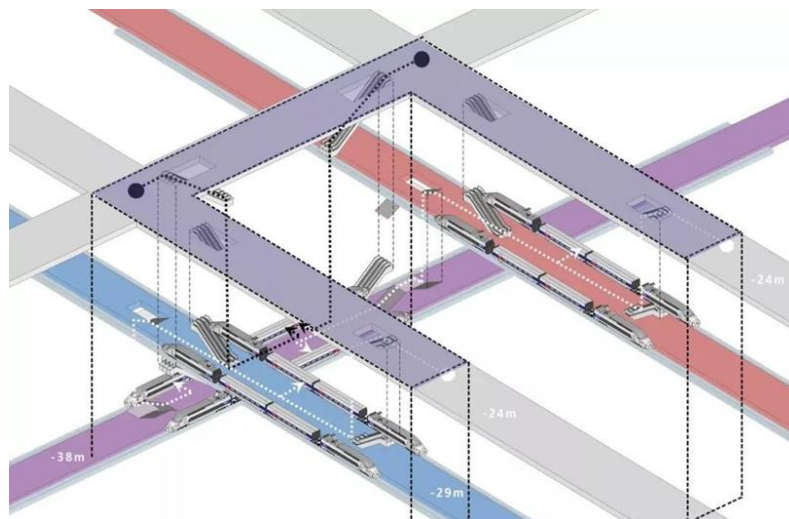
Connecting underground transportation facilities in Jiangbei new town
